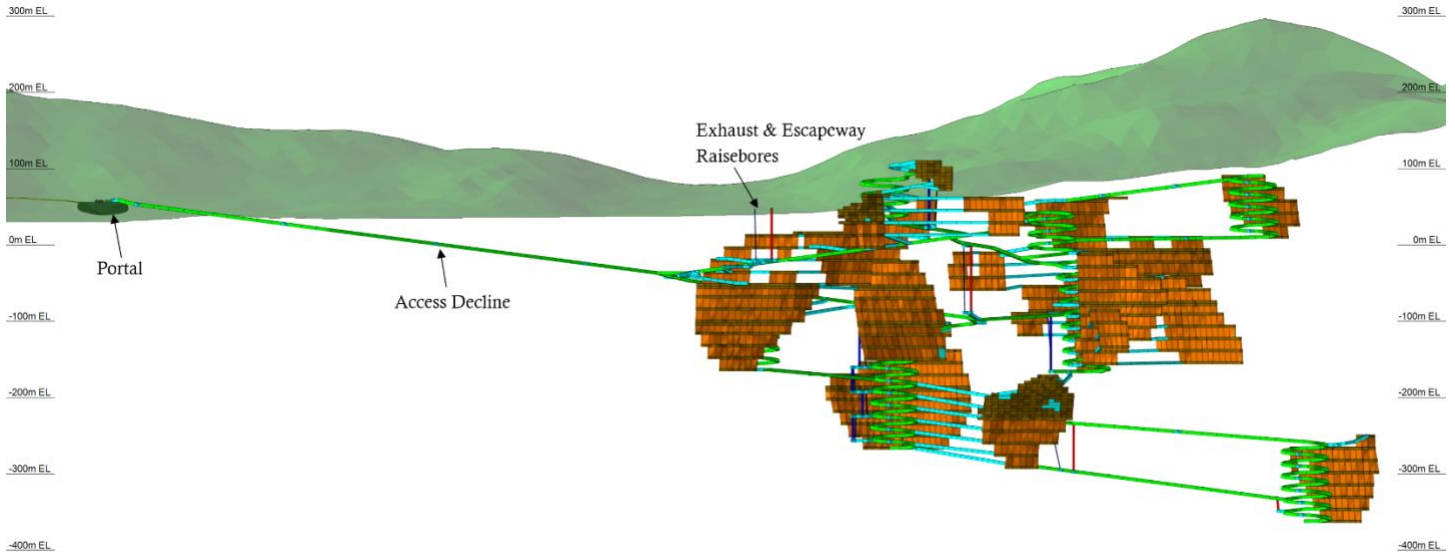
Side View of Underground Mine Plan Looking North, Showing Overlying Surface Terrain
